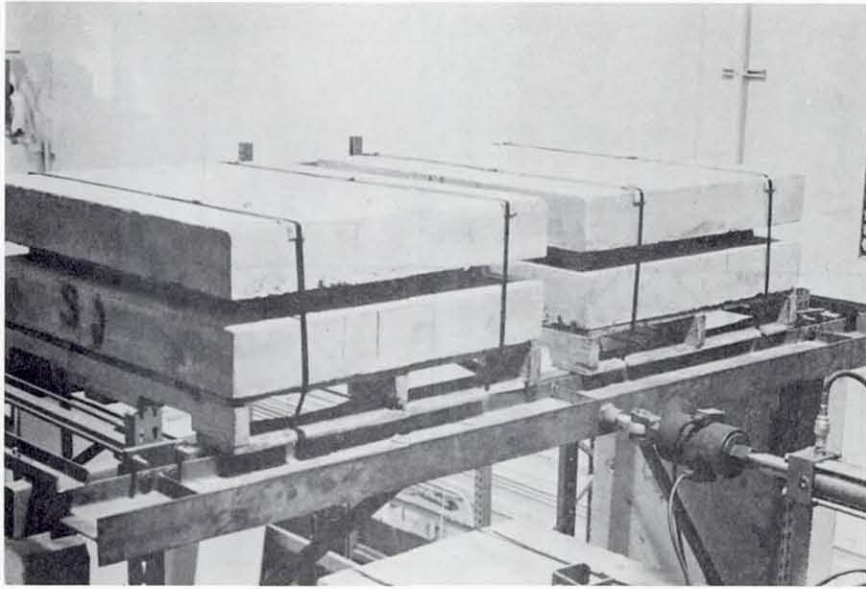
Horizontal Loading Arrangement -- Transverse Tests
